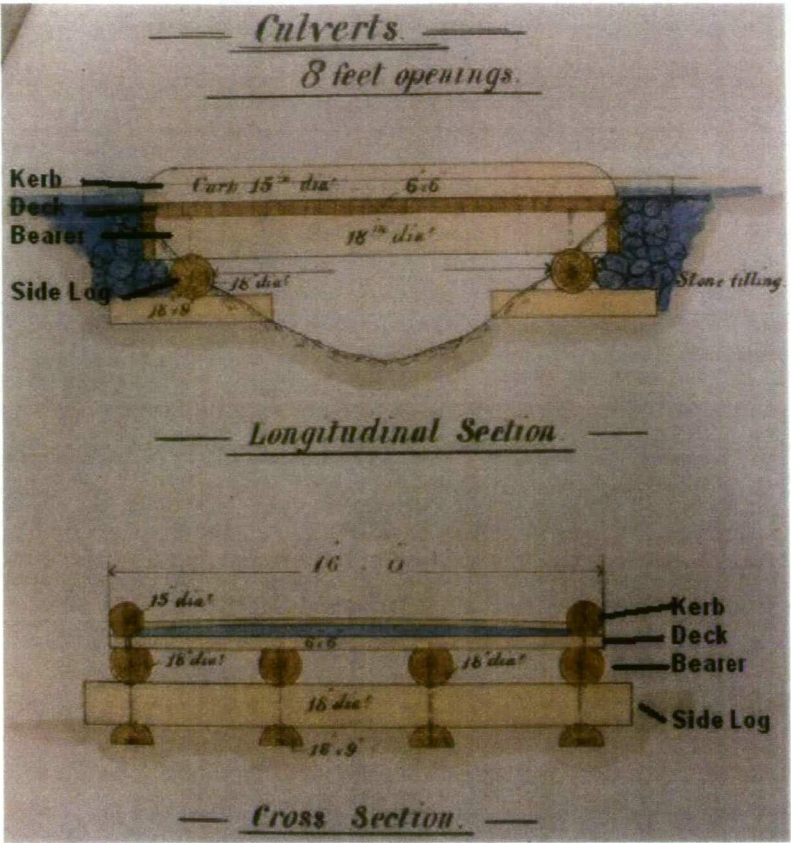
Arrangement of Culvert ¹⁶⁸
